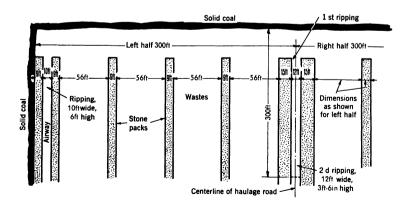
Strip packing – advancing long-wall.⁽¹²⁾
